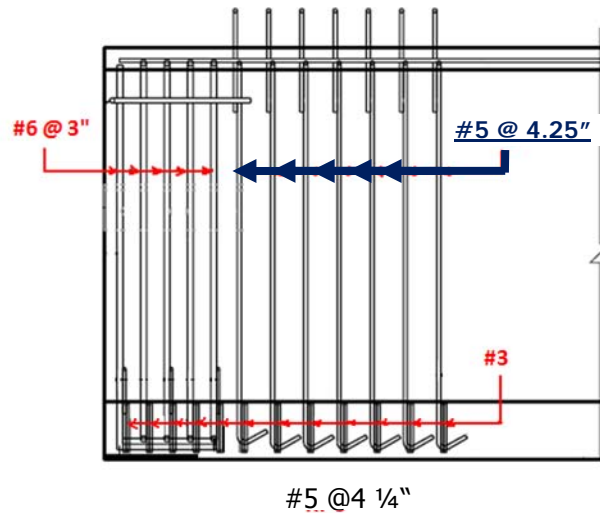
Reinforcement configuration where the size of the vertical reinforcement bars away from the girder end are varied from the standard pattern #4 to #5 bars.
